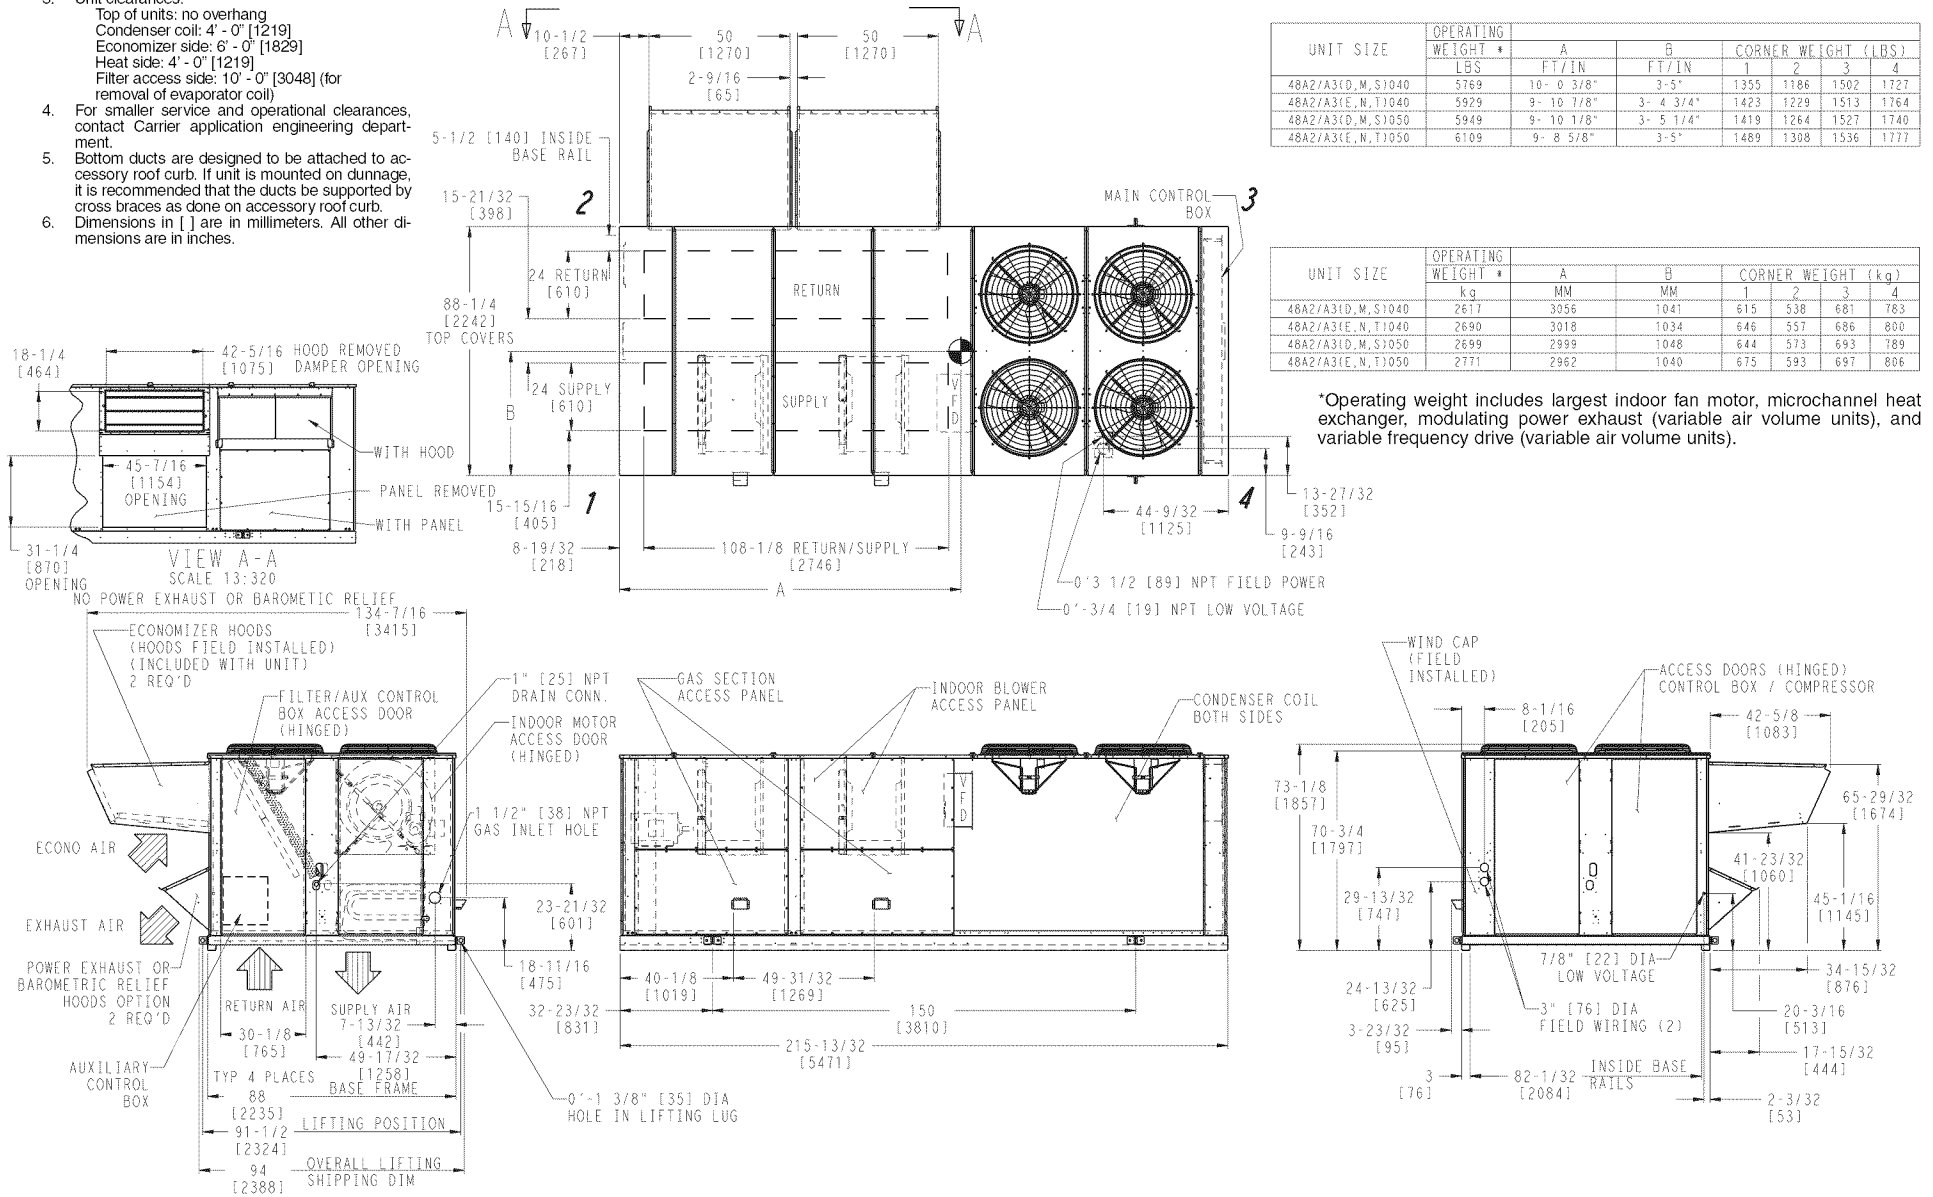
Base Unit Dimensions — 48A2,A3020-035
